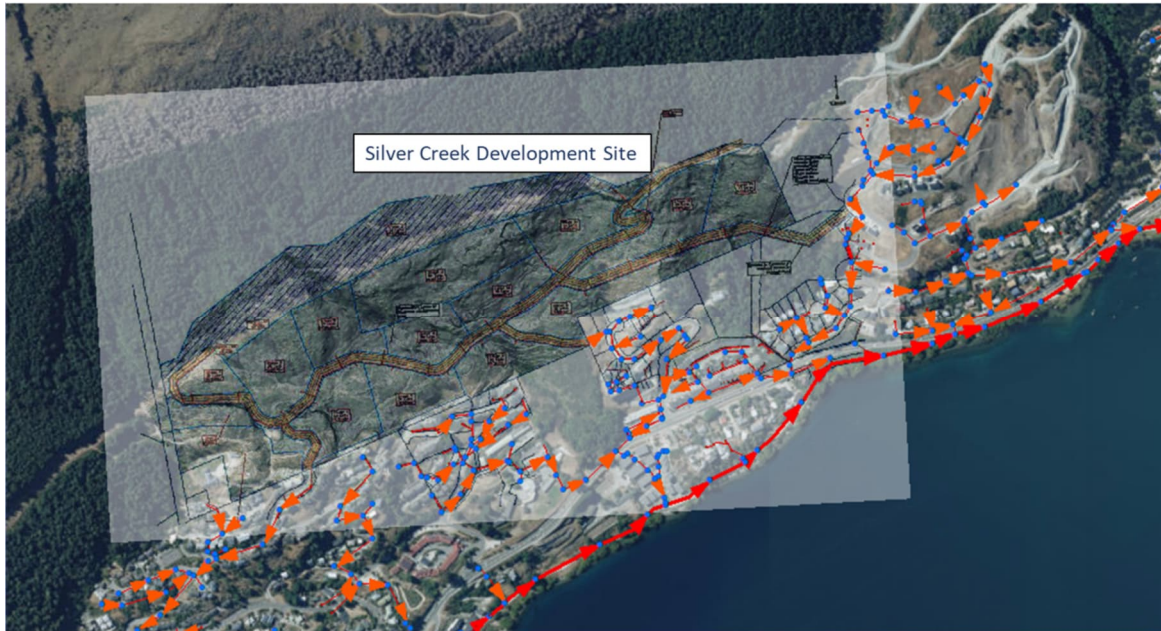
Silver Creek (SILVER CREEK) DEVELOPMENT SITE location
